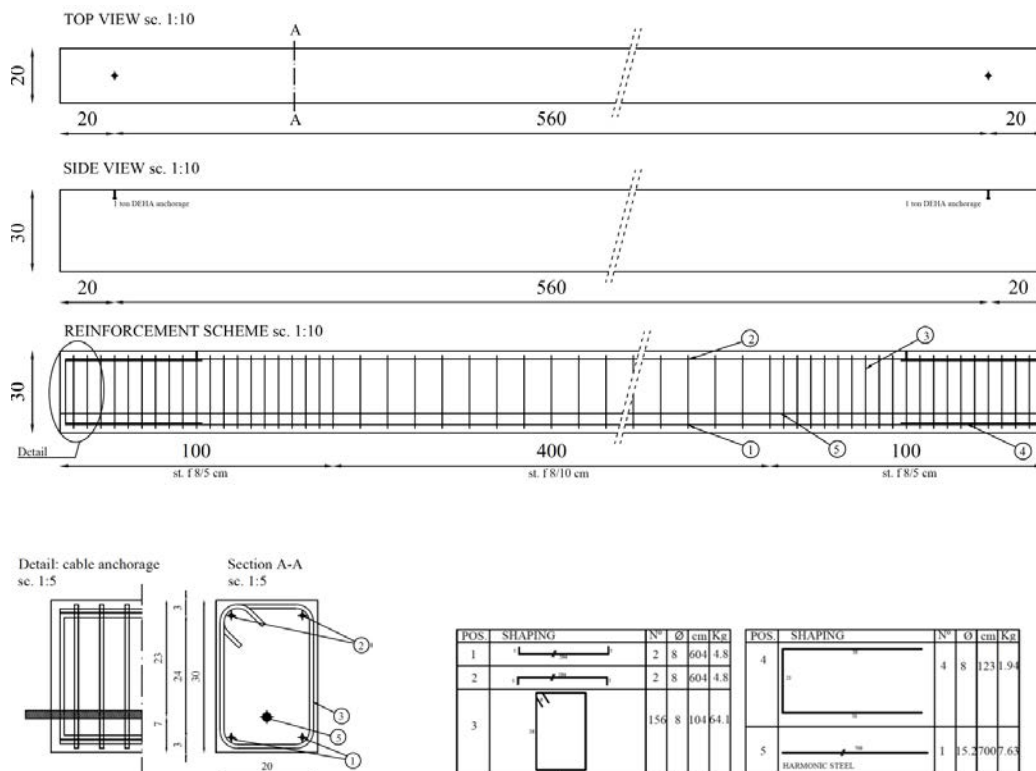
Beams 1, 2 and 3: geometrical and reinforcement dimensions (not to scale)
